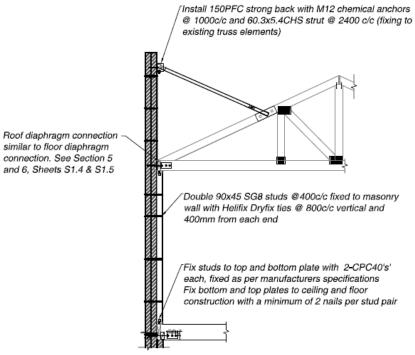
Parapet Tie back and URM Out of plane restraint typical remedial detail
